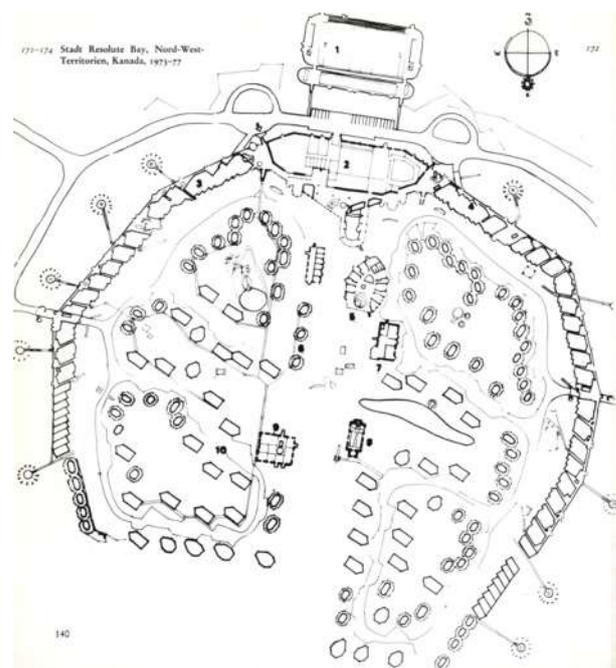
Initial site plan (Collymore and Erskine, 1994, p.134)
